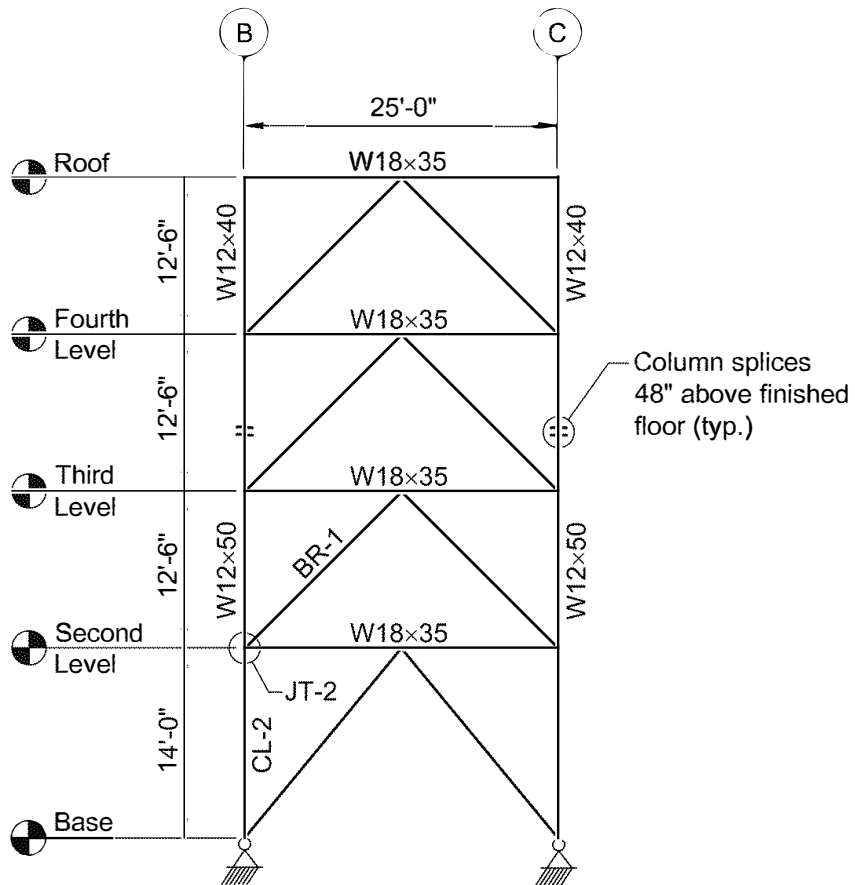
Braced frame elevation for Examples 3.5.1, 3.5.2 and 3.5.3.
